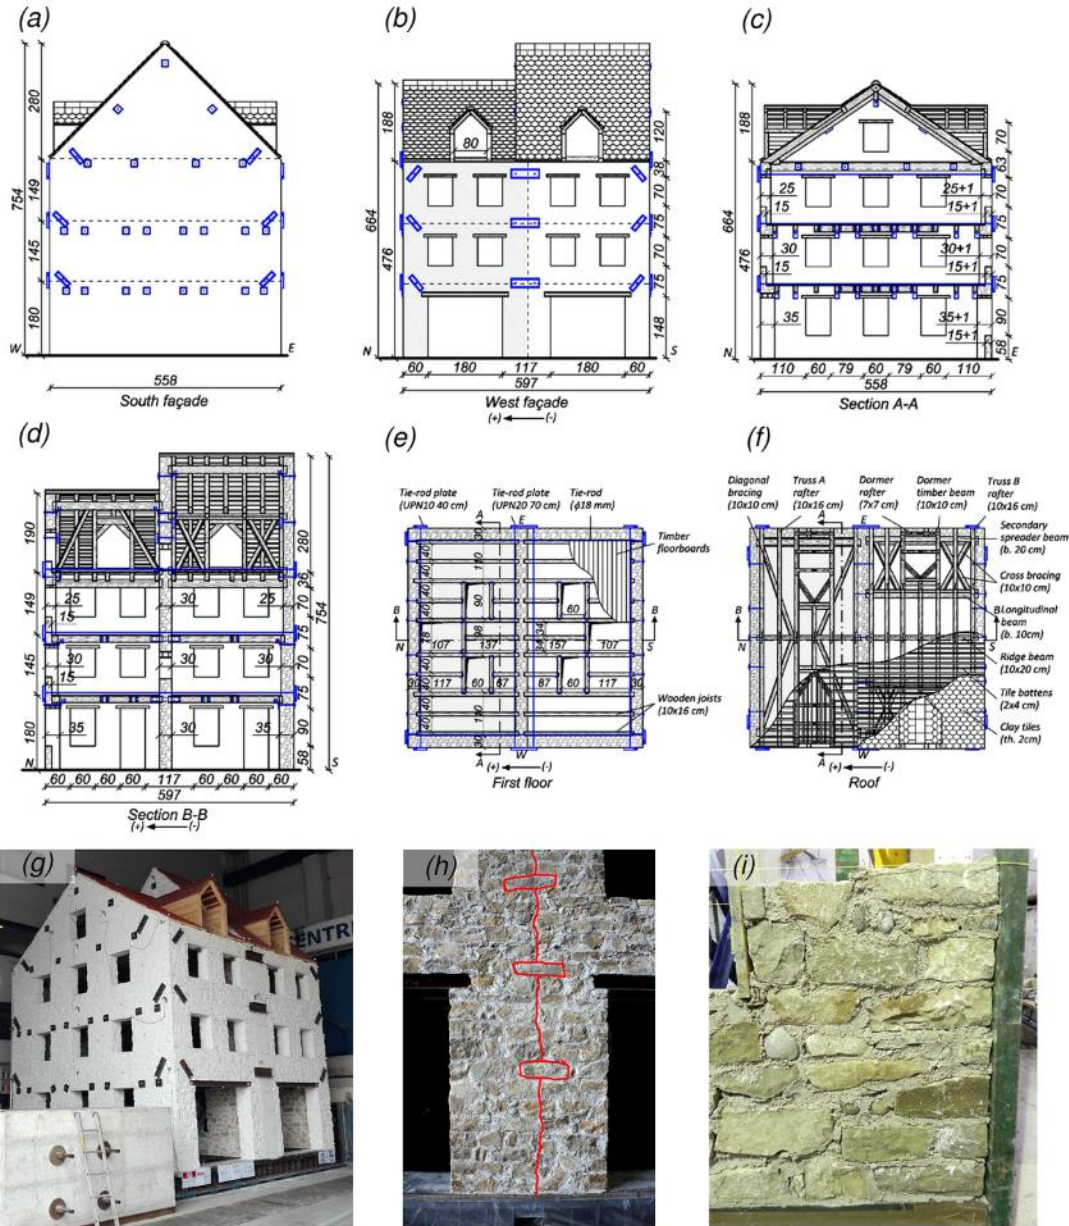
Building aggregate prototype: (a) South façade; (b) West façade; (c) section looking North; (d) section looking East; (e) first-floor plan; (f) roof plan; (g) photo of the North-West corner; (h) vertical joint between structural units on the West-wall outer leaf, marked in red. Units of cm.
